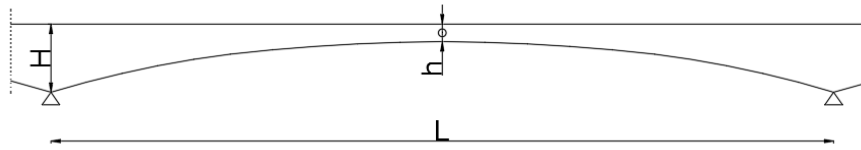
Initial sizing – haunch deck (not at scale)
